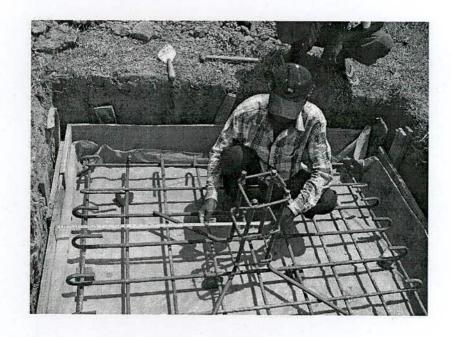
Construction of footing on Rammed Aggregate Piers treated ground.
